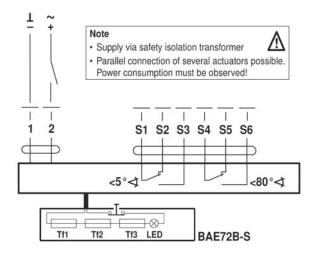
Wiring scheme of actuator BELIMO BLF24-T
